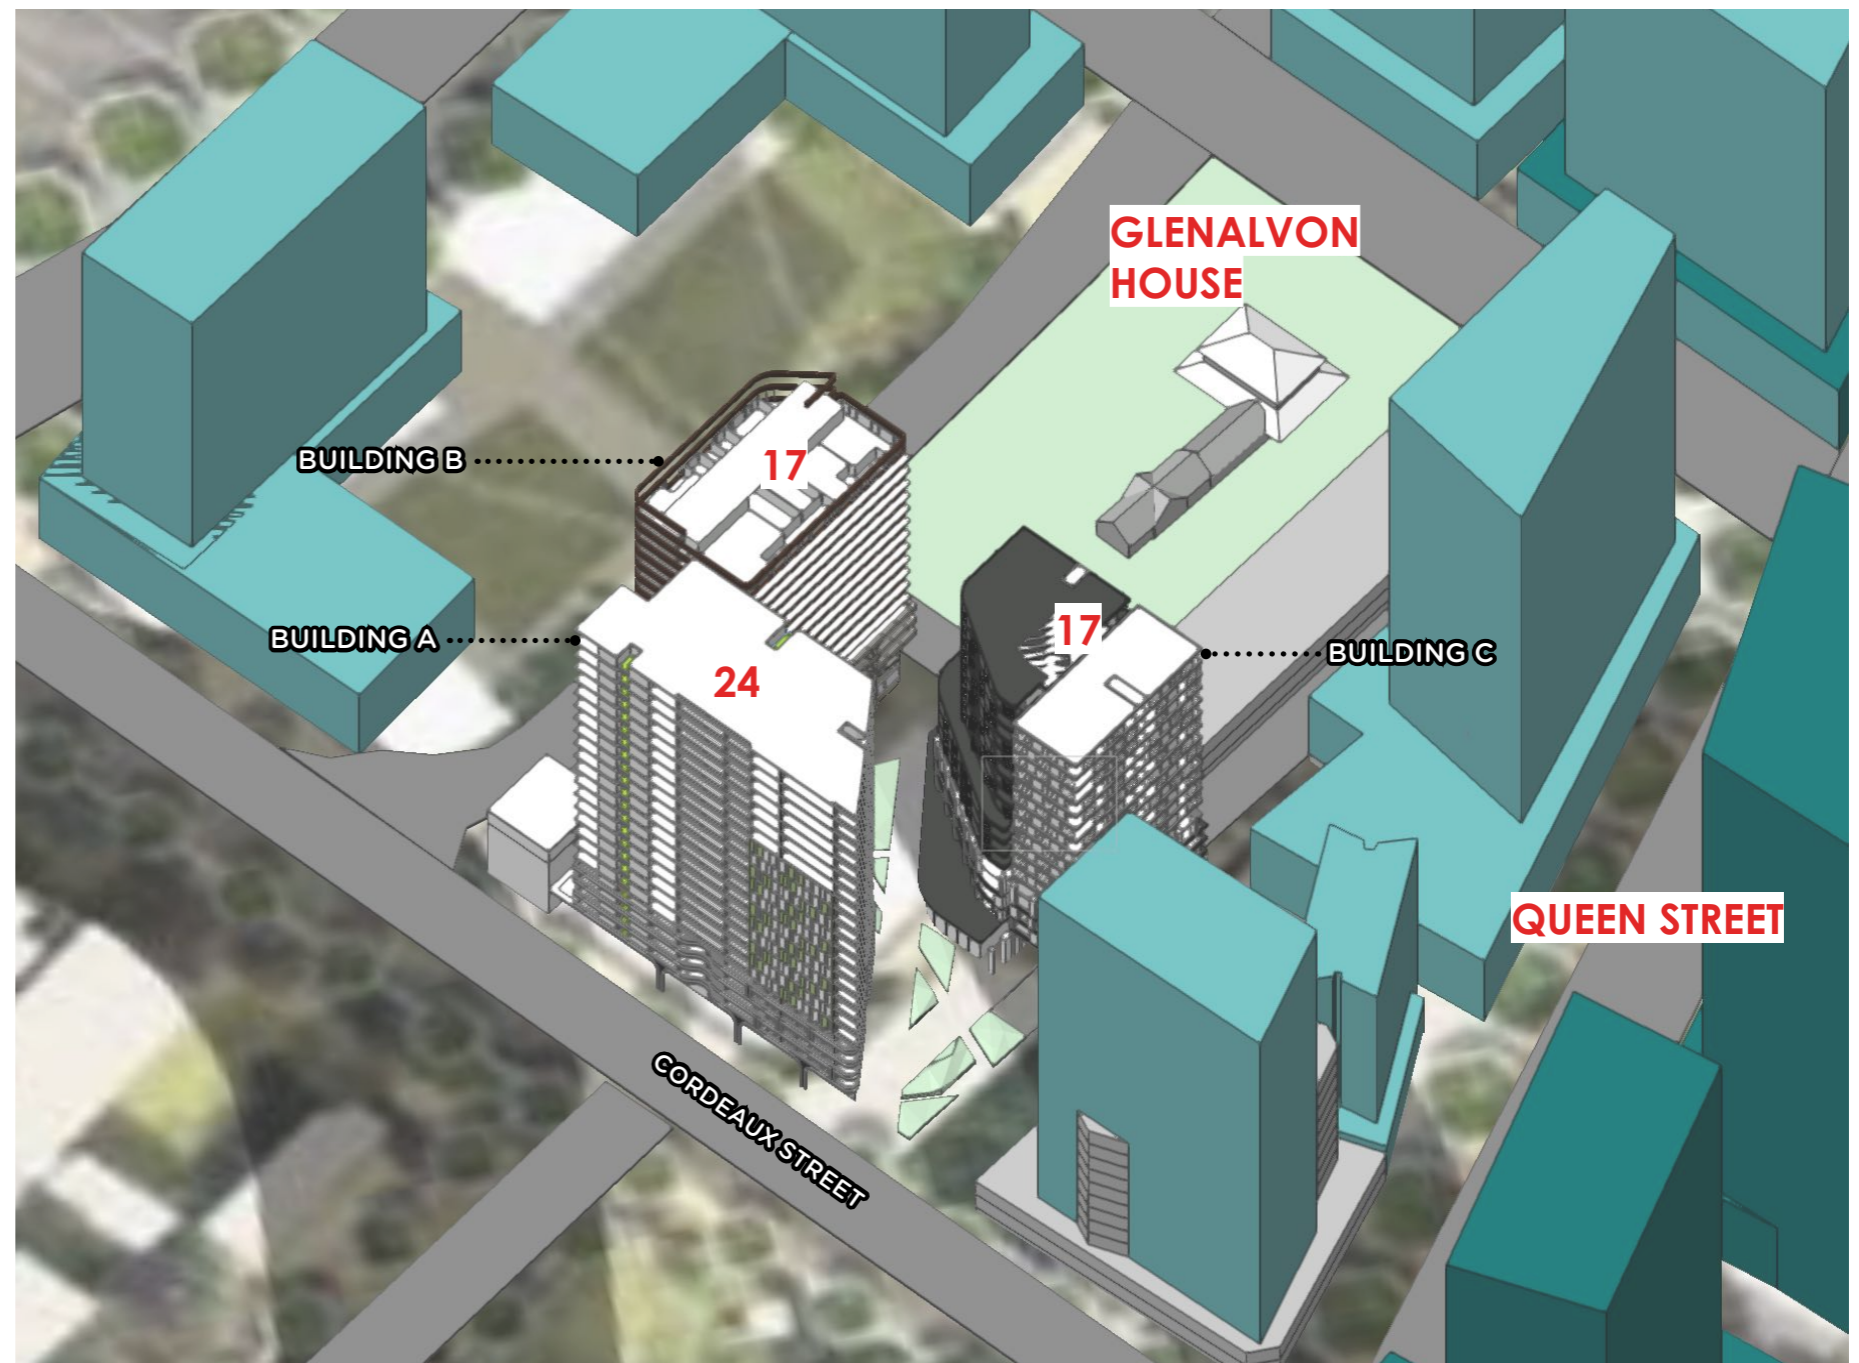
Alternative Proposal - Building Massing (Source: Aleksandar Design Group)
